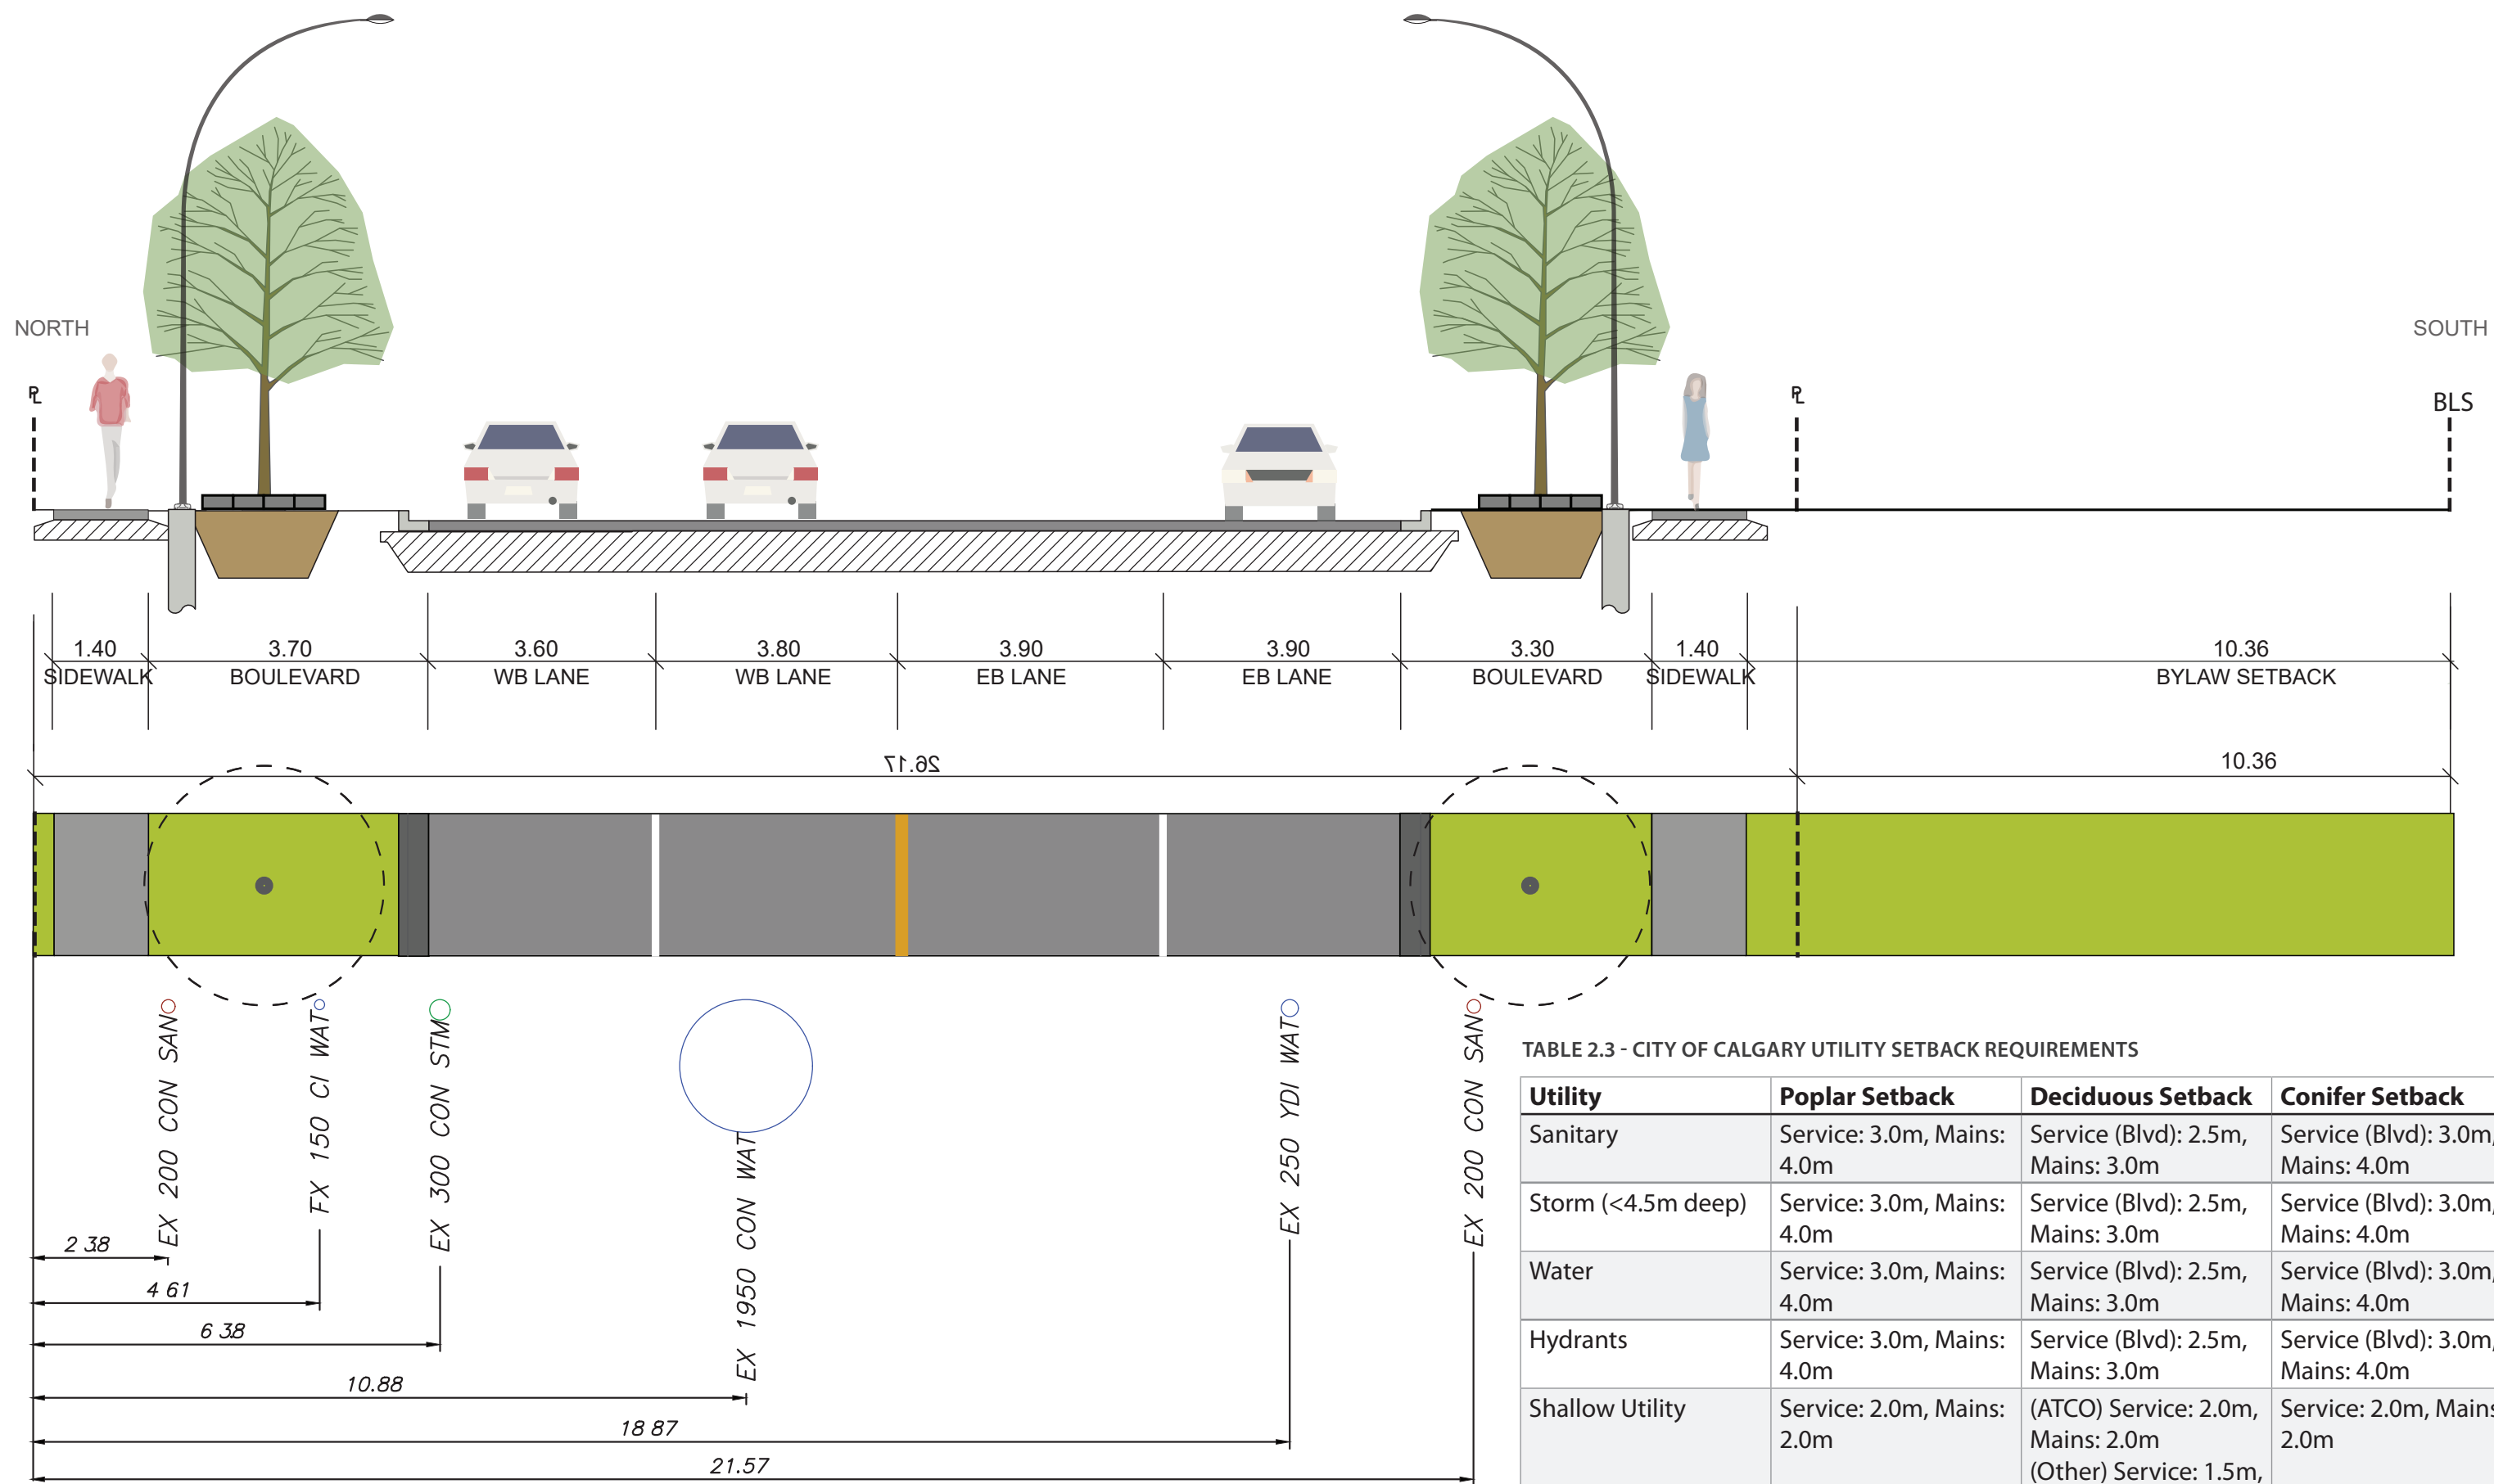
CROSS SECTION SHOWING DEEP UTILITIES ALONG 16 AVENUE, EAST OF 45 STREET NW (LOOKING EAST)
